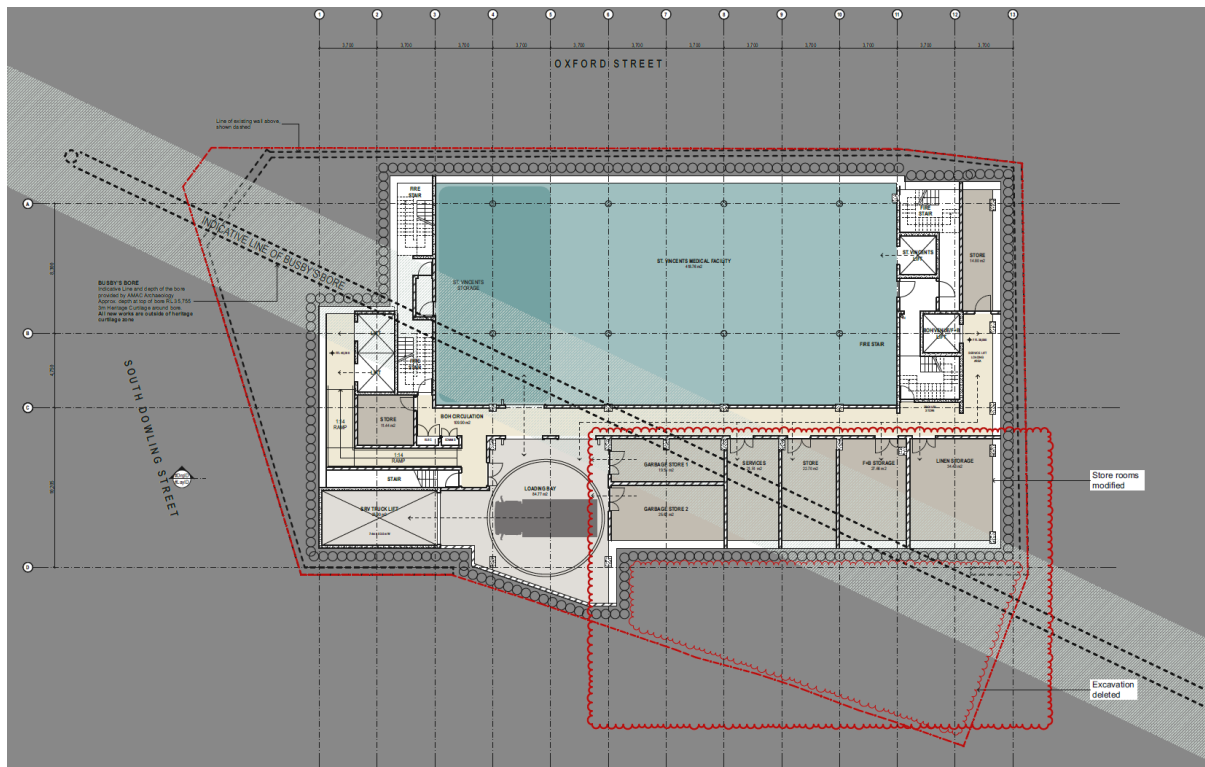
Site plan of the indicative concept design. Drawing pp.01
